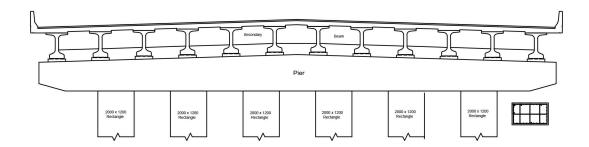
AutoCAD Drawing of midspan cross-section of proposed replacement bridge
